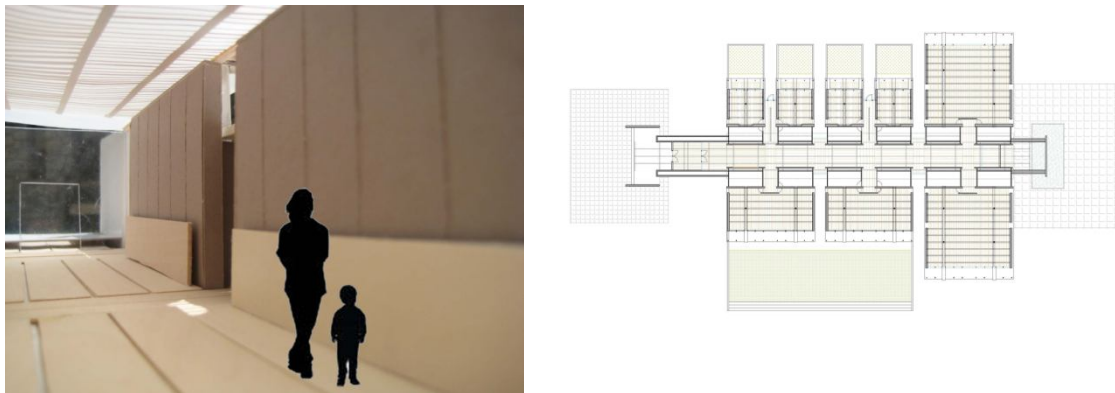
Elevation (left) of lobby and plan view of a proposed kindergarten.
